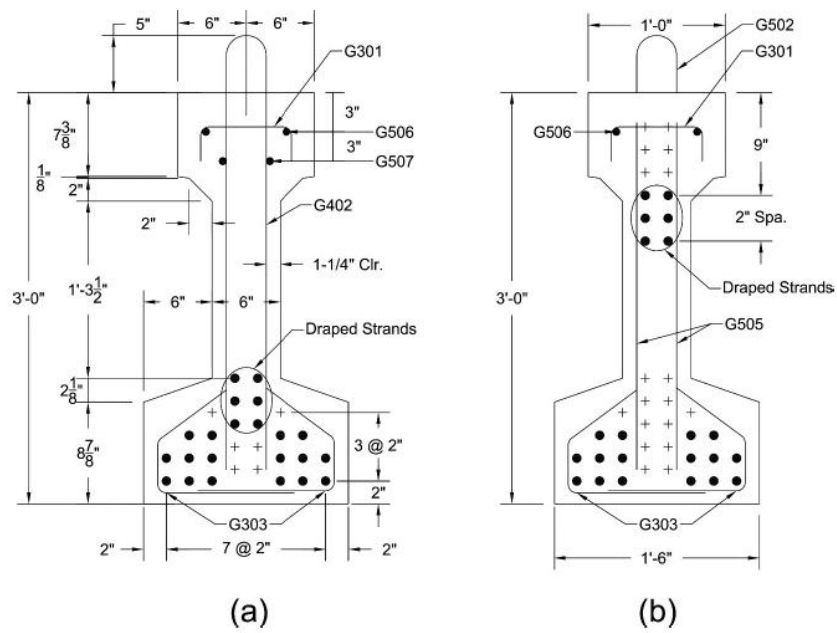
Laboratory bridge girder details (a) mid span and (b) end cross section details [35]
